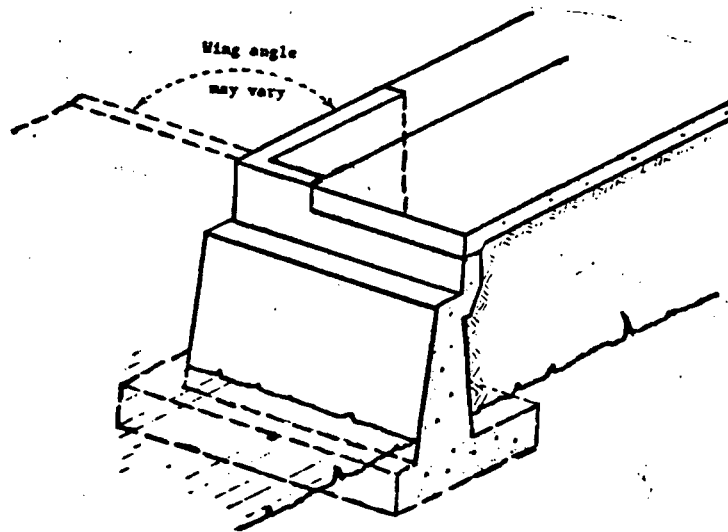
Typical closed or retaining wall abutment (from Ref 2).
